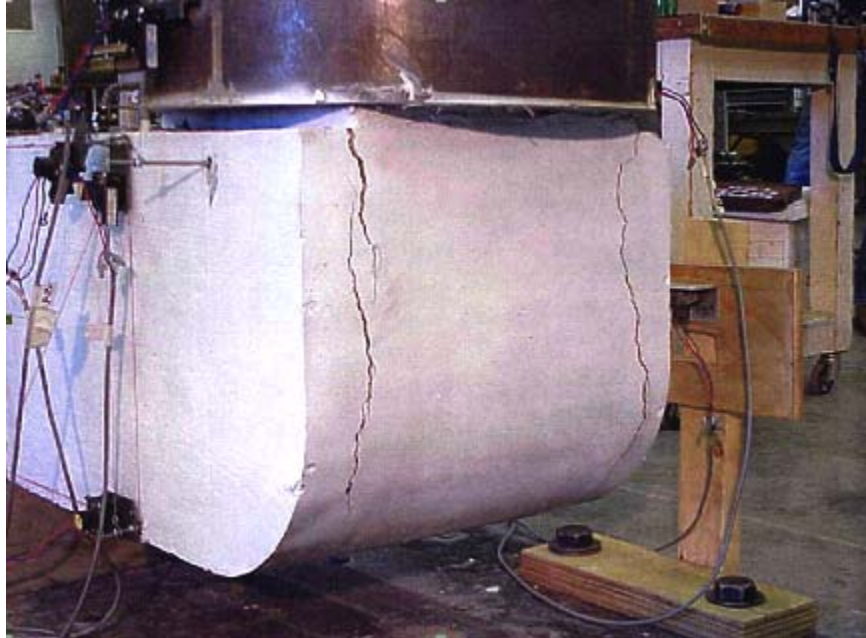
Bond Splitting Failure in the Back Face of Specimen ASO
